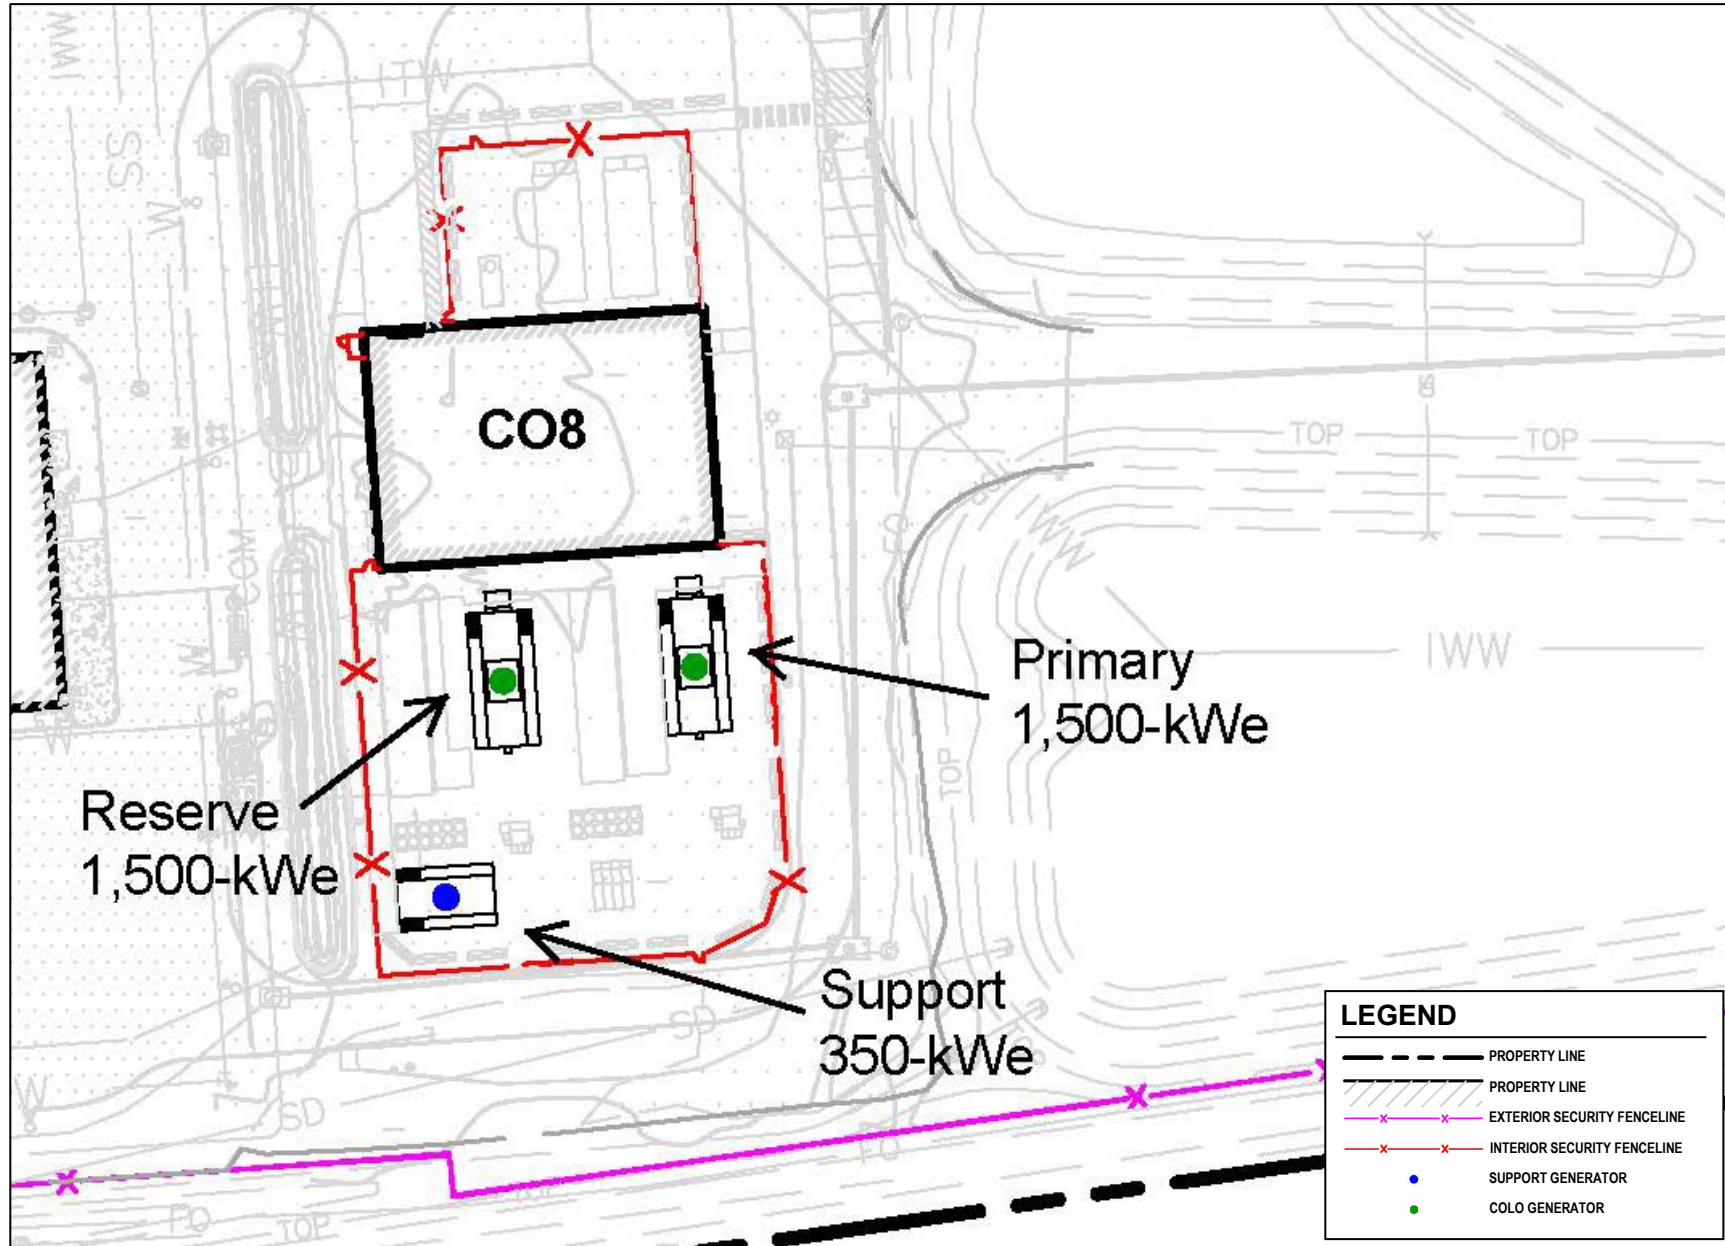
Plan View Site Map, CO8 Building and Generator Engines
